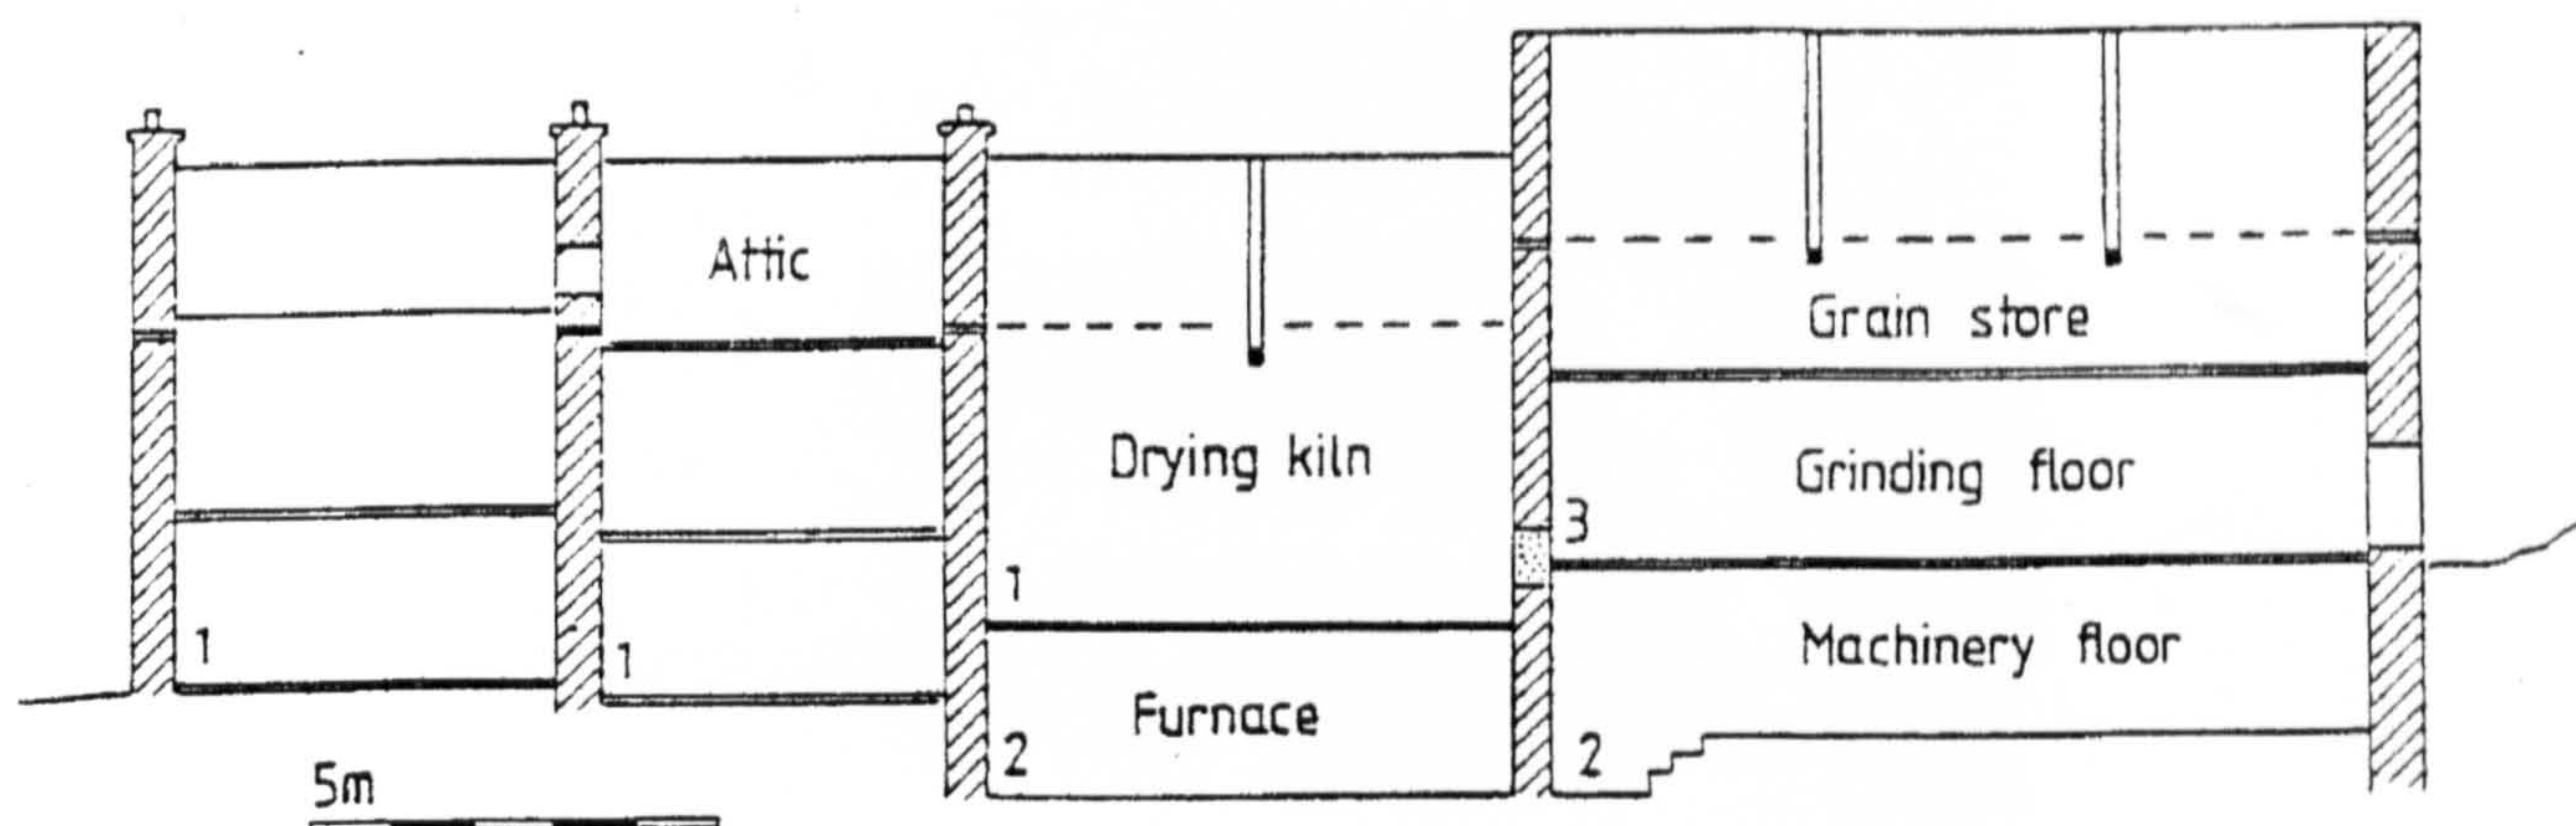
A section through Harracles Mill. 16th century masonry survives round the blocked window opening between the drying kiln and the grinding floor. The attic is above the eighteenth century house.
